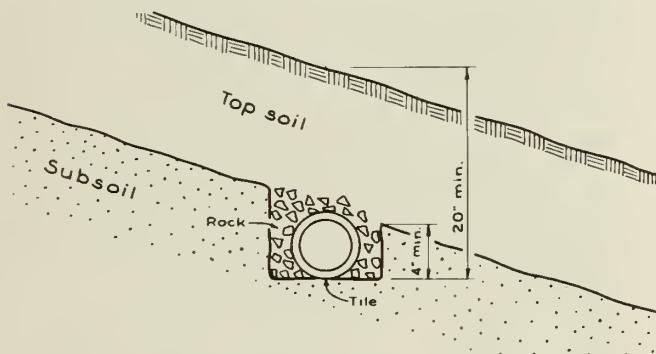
Cross section of typical tile drain installation, showing tile located in subsoil to insure intercepting all water and to prevent water from re-entering the topsoil on the downhill side.
